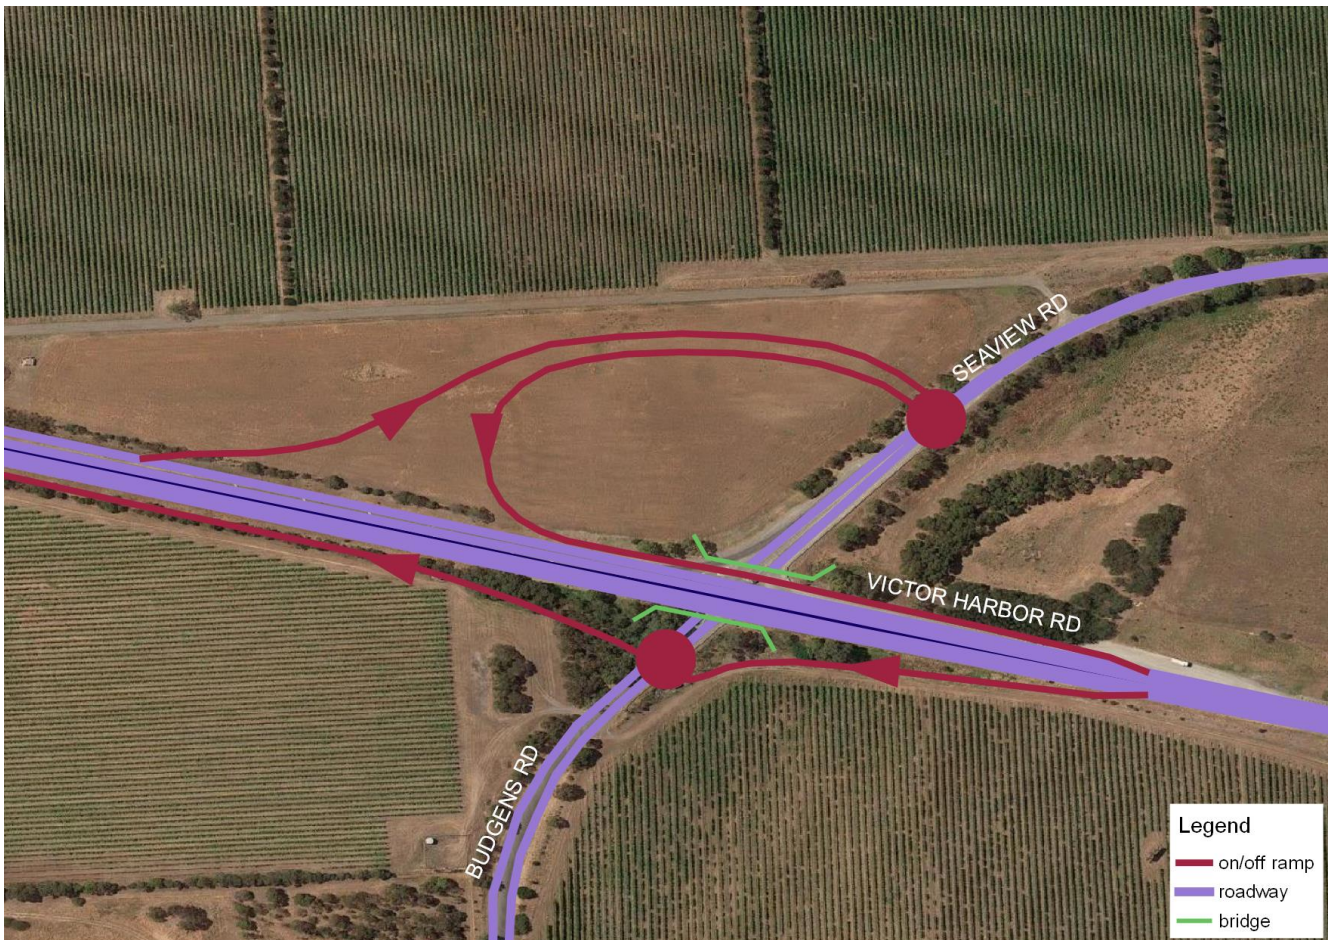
Potential layout of a grade separated Seaview Road/Victor Harbor Road intersection
